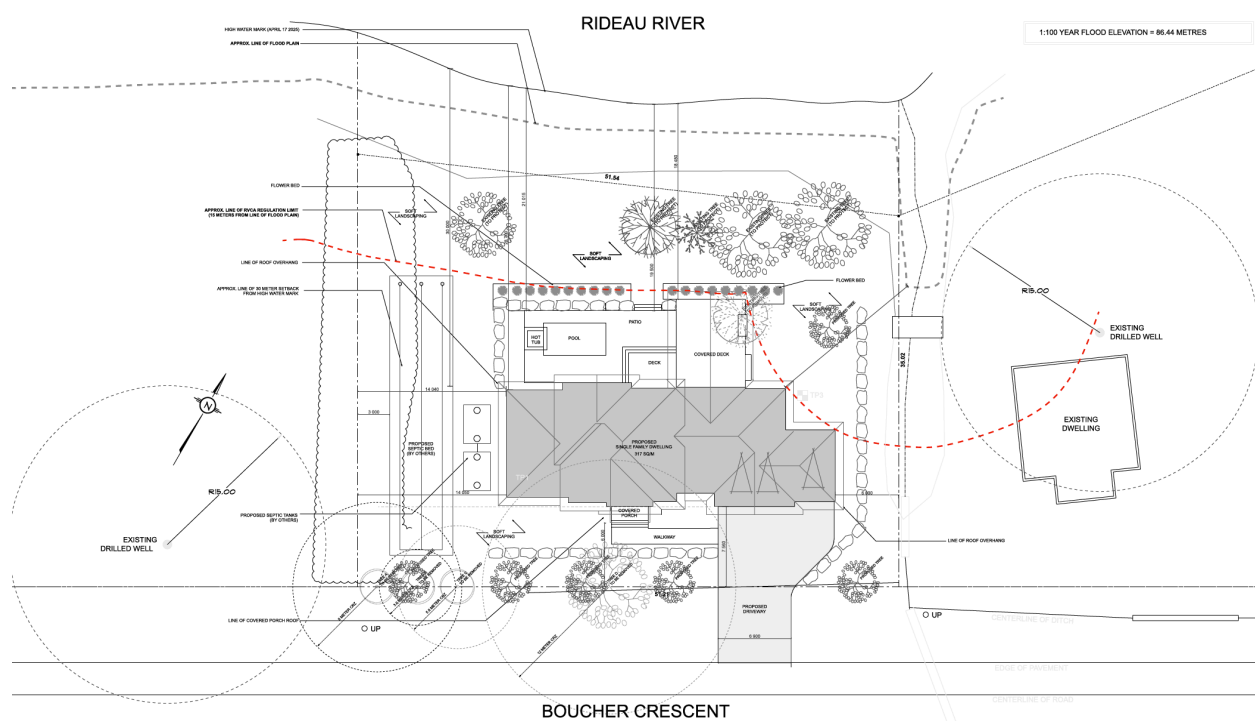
Proposed Site Plan (Source: Ardington & Associates)
